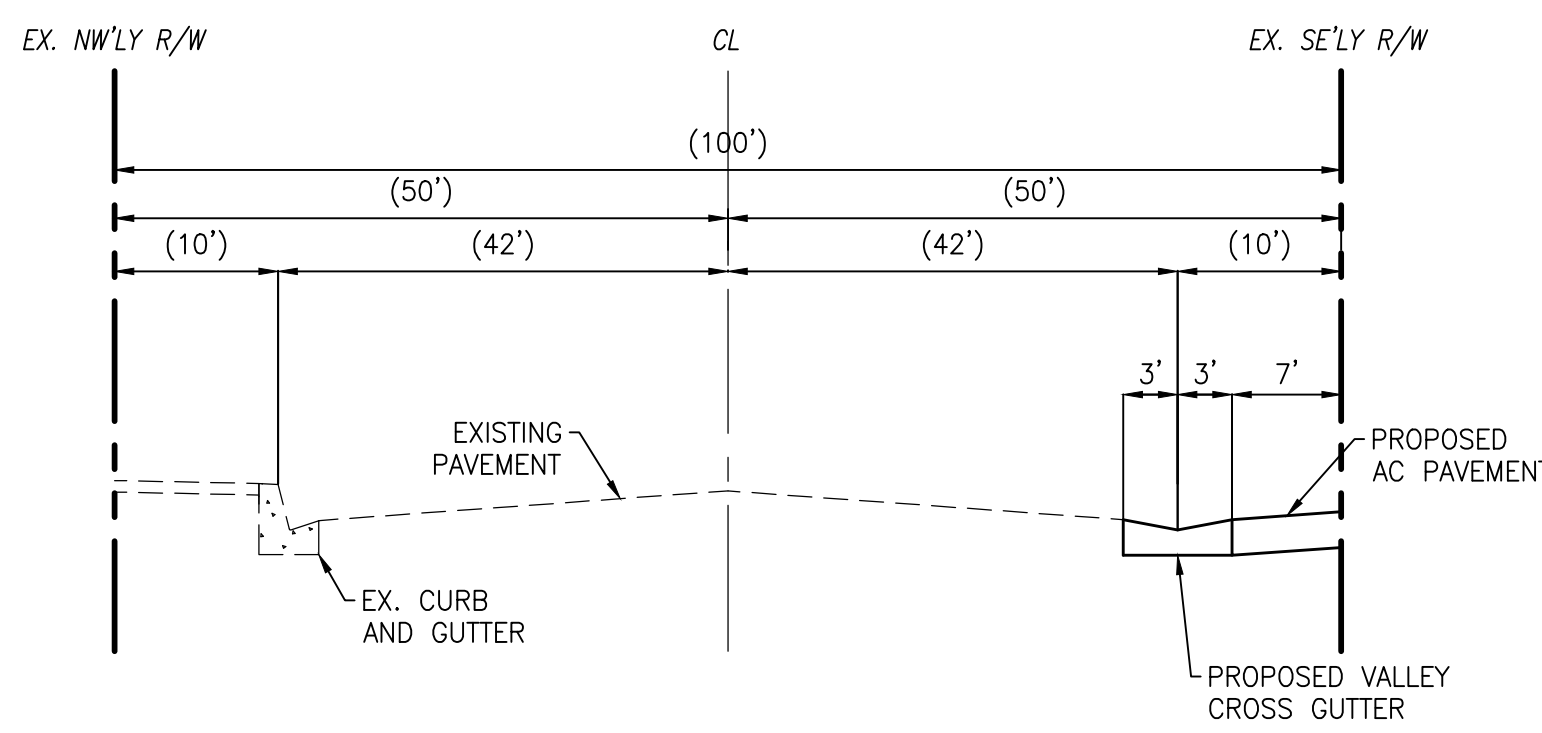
PROPOSED EAST WALNUT DRIVE PUBLIC STREET TYPICAL SECTION AT "A" STREET AND PA-3
